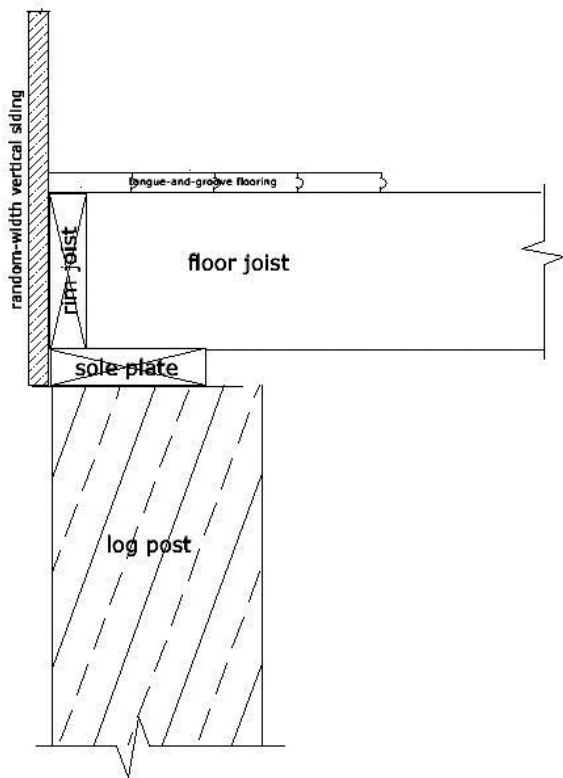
Detail of joist and wall connection typical of the original part of the cabin.
